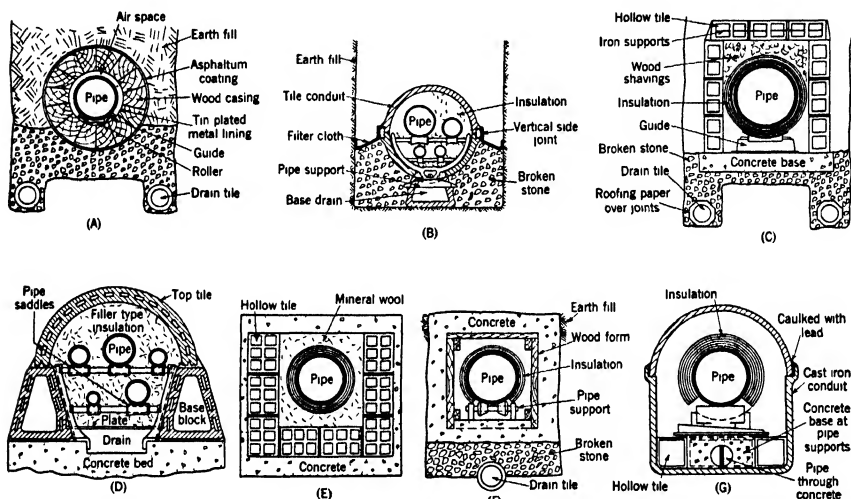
CONSTRUCTION DETAILS OF CONDUITS COMMONLY USED
